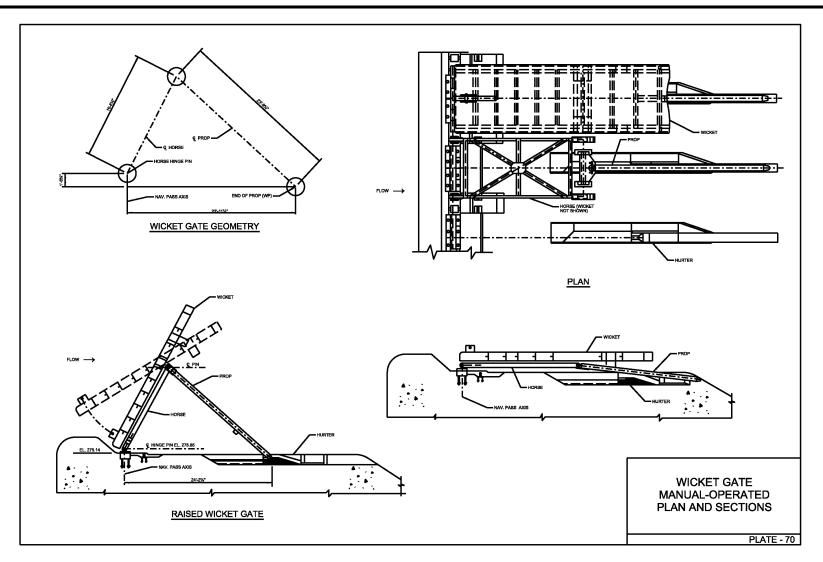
Plate 70: Wicket gate manual operated plan and sections
